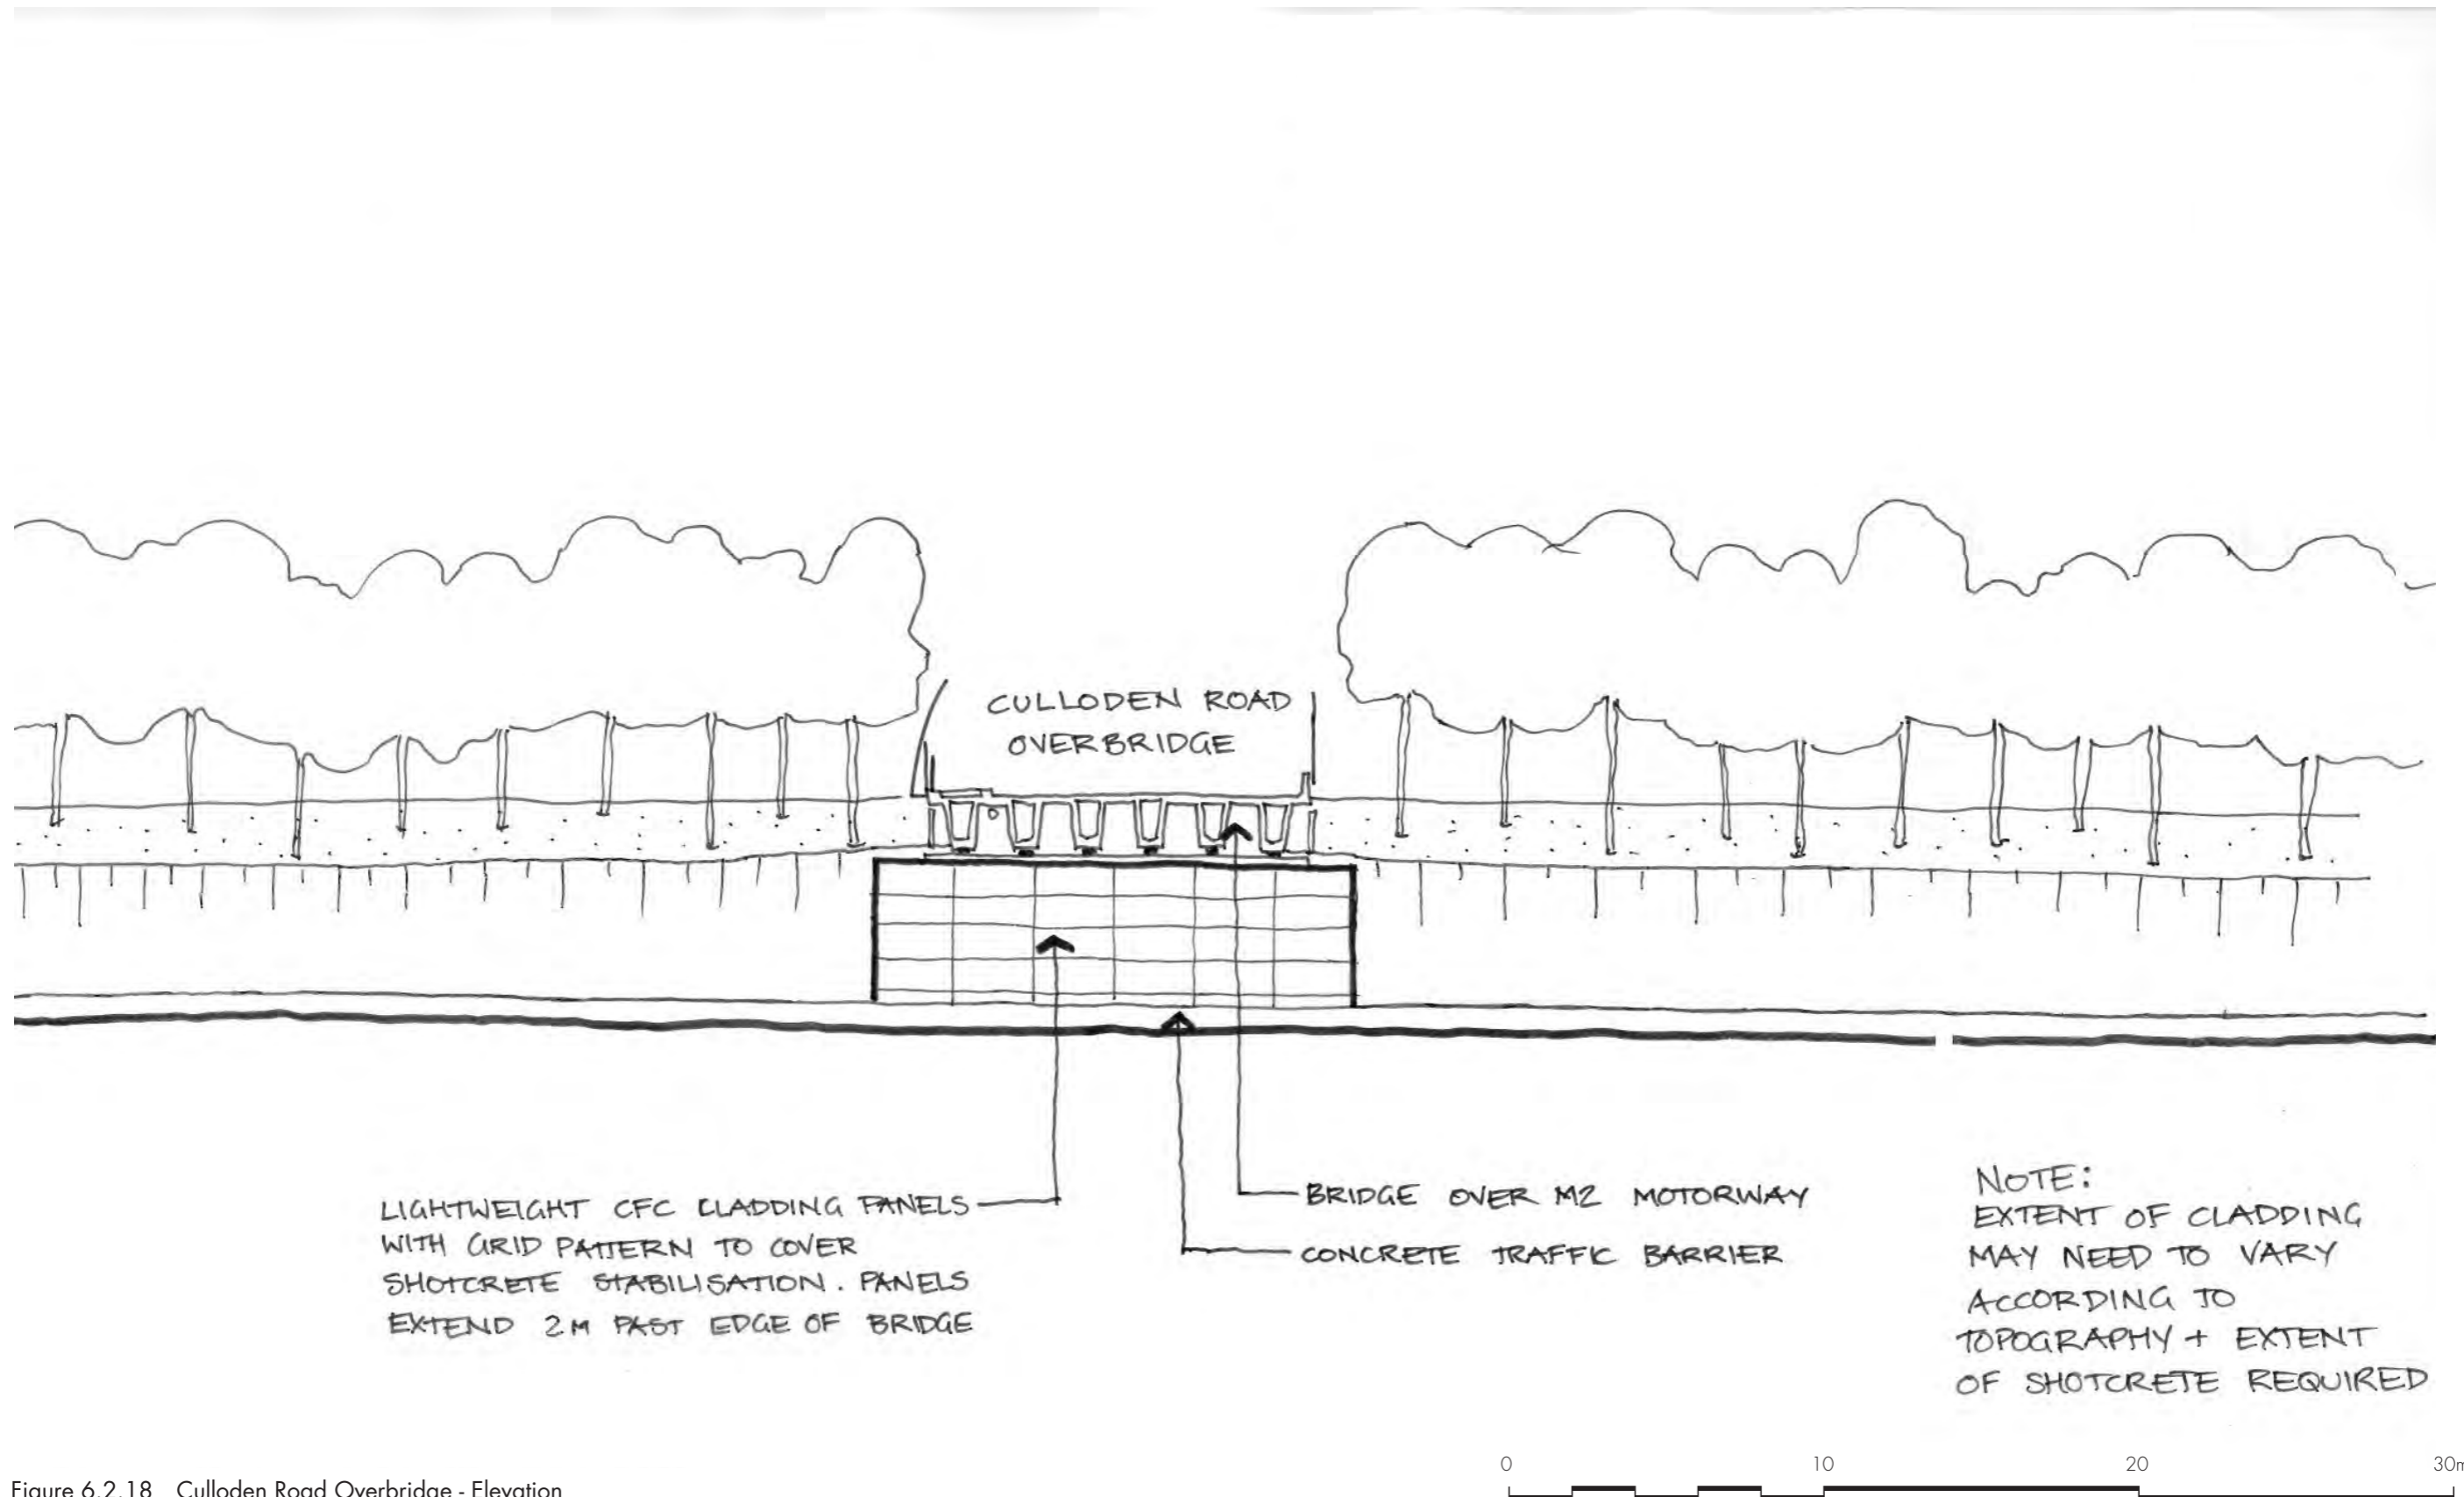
Culloiden Road Overbridge - Elevation
